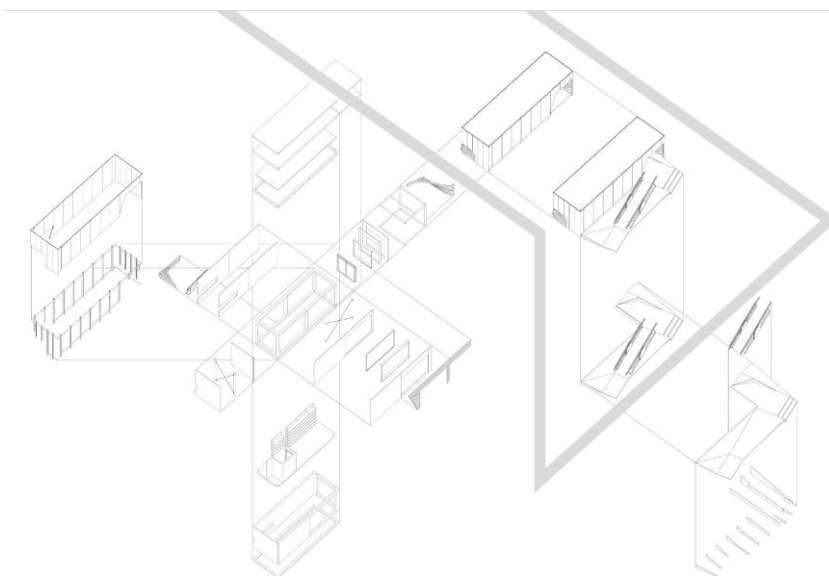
Construction scheme of the pavilion. Source: K. Więcek
